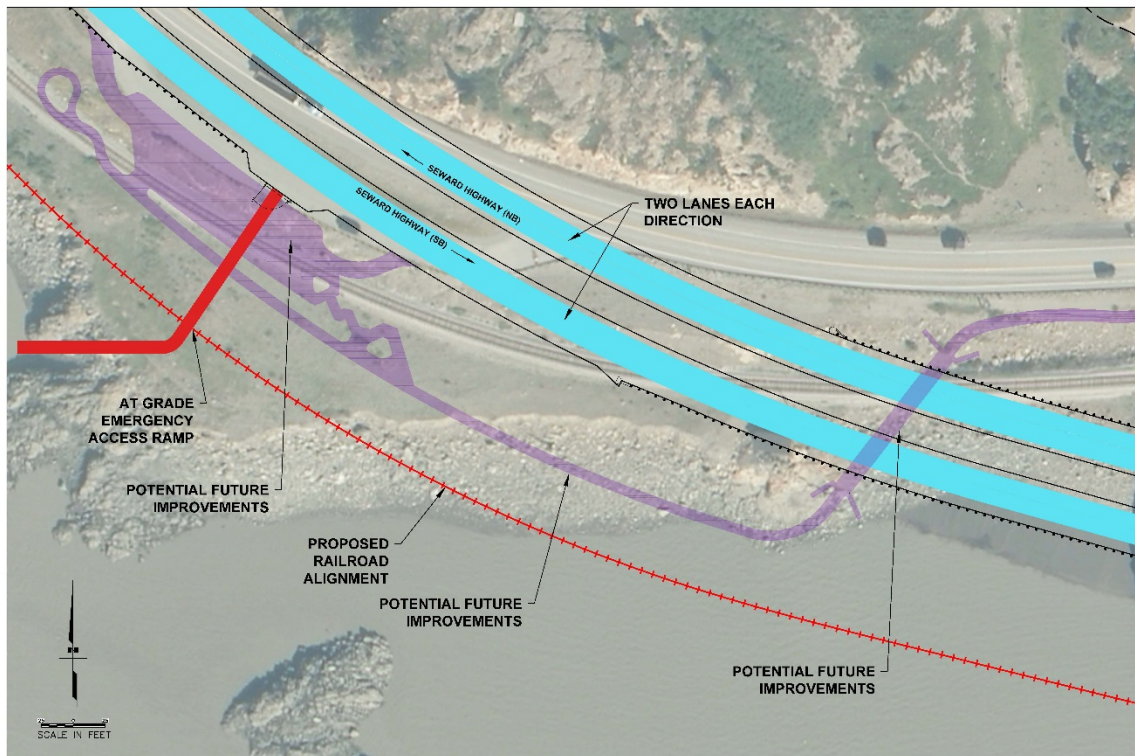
Proposed Southbound Emergency Staging Area and Boat Ramp Facilities
